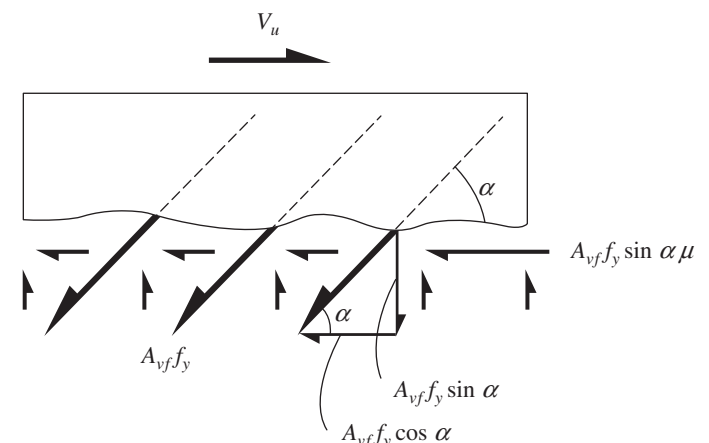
Shear friction reinforcement at an angle to assumed crack
